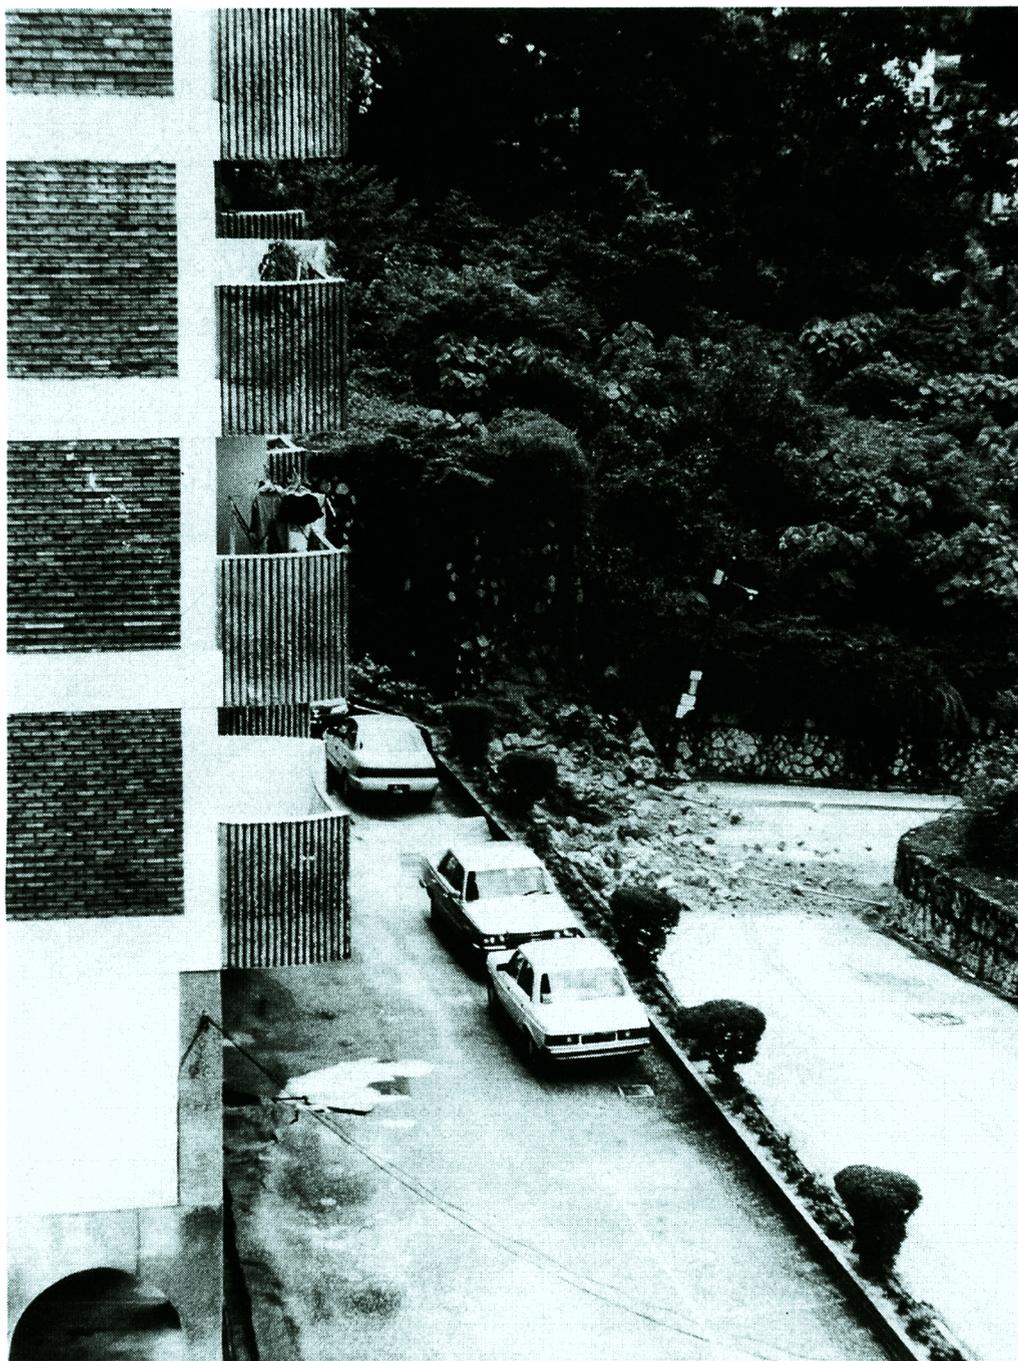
Collapsing retaining wall on side of the building and cracks on parking ground.
